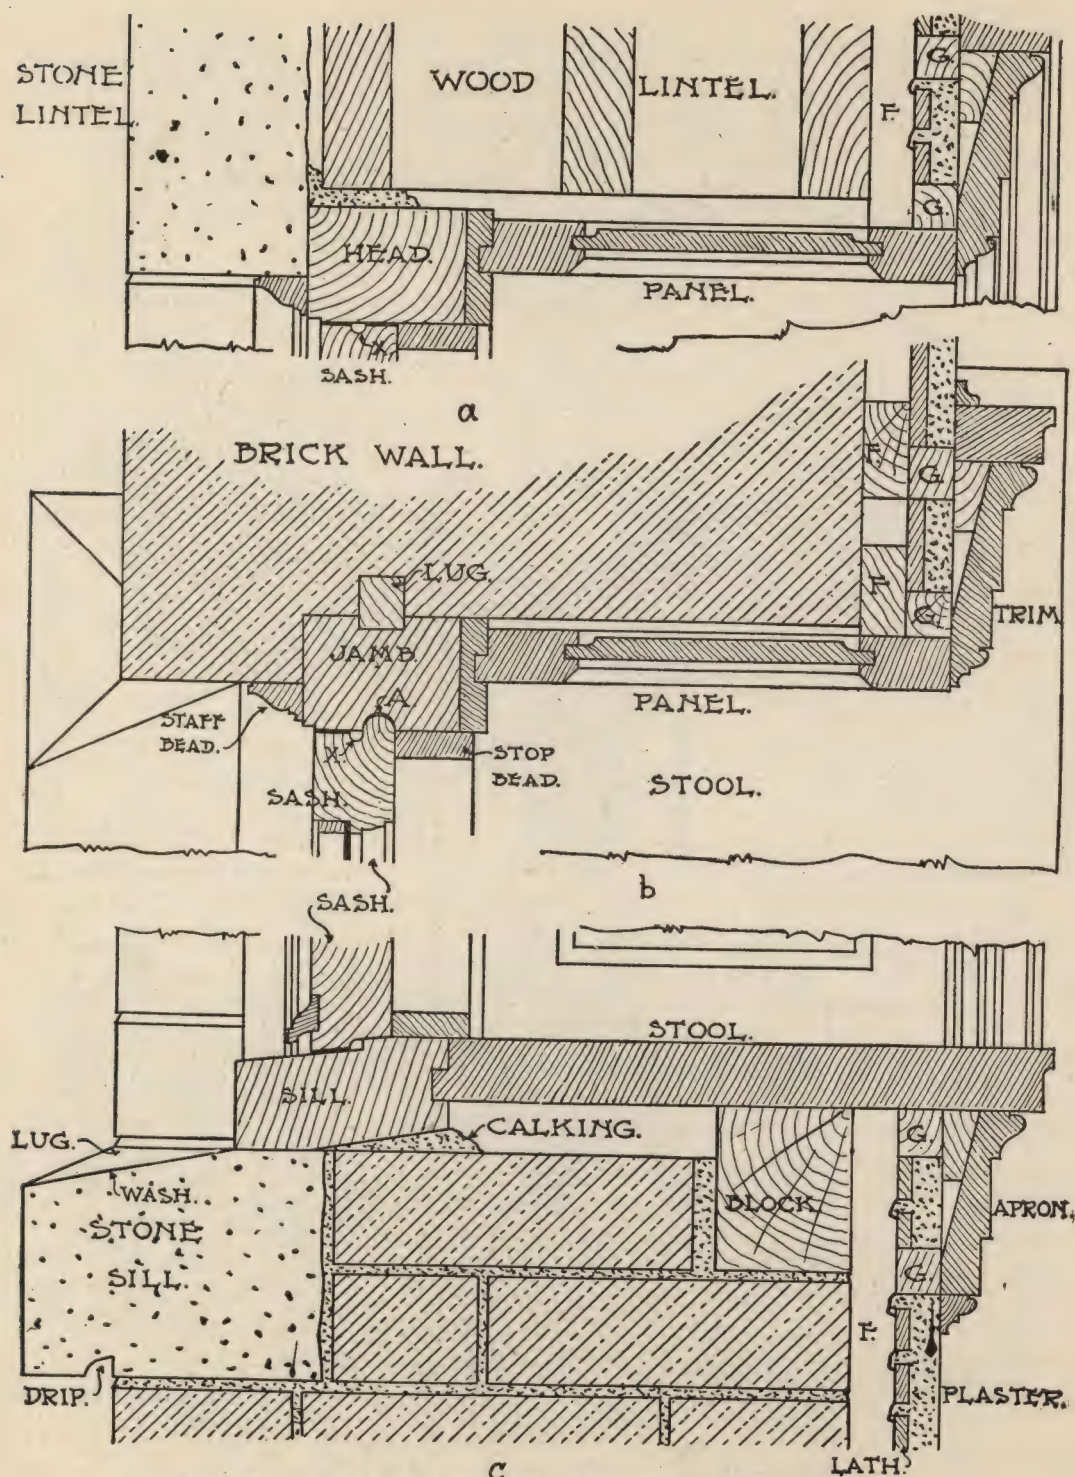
OUTWARD-OPENING CASEMENT IN BRICK WALL.
